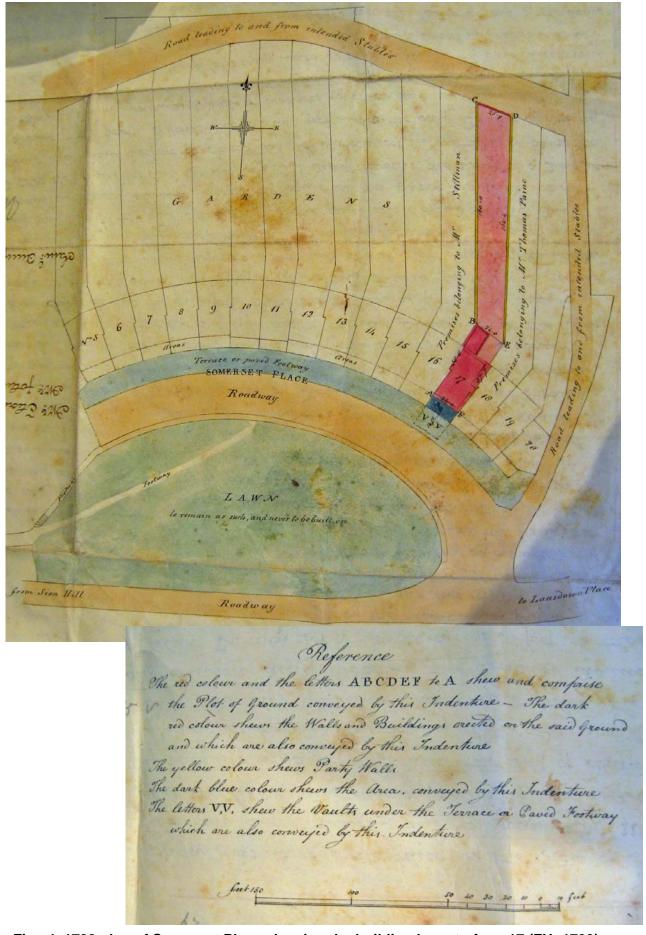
1793 plan of Somerset Place showing the building layout of no. 17 (FH: 1793)
